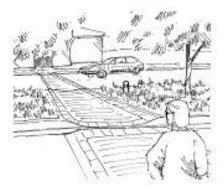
Raised Walkway Crossing Parking Aisles
